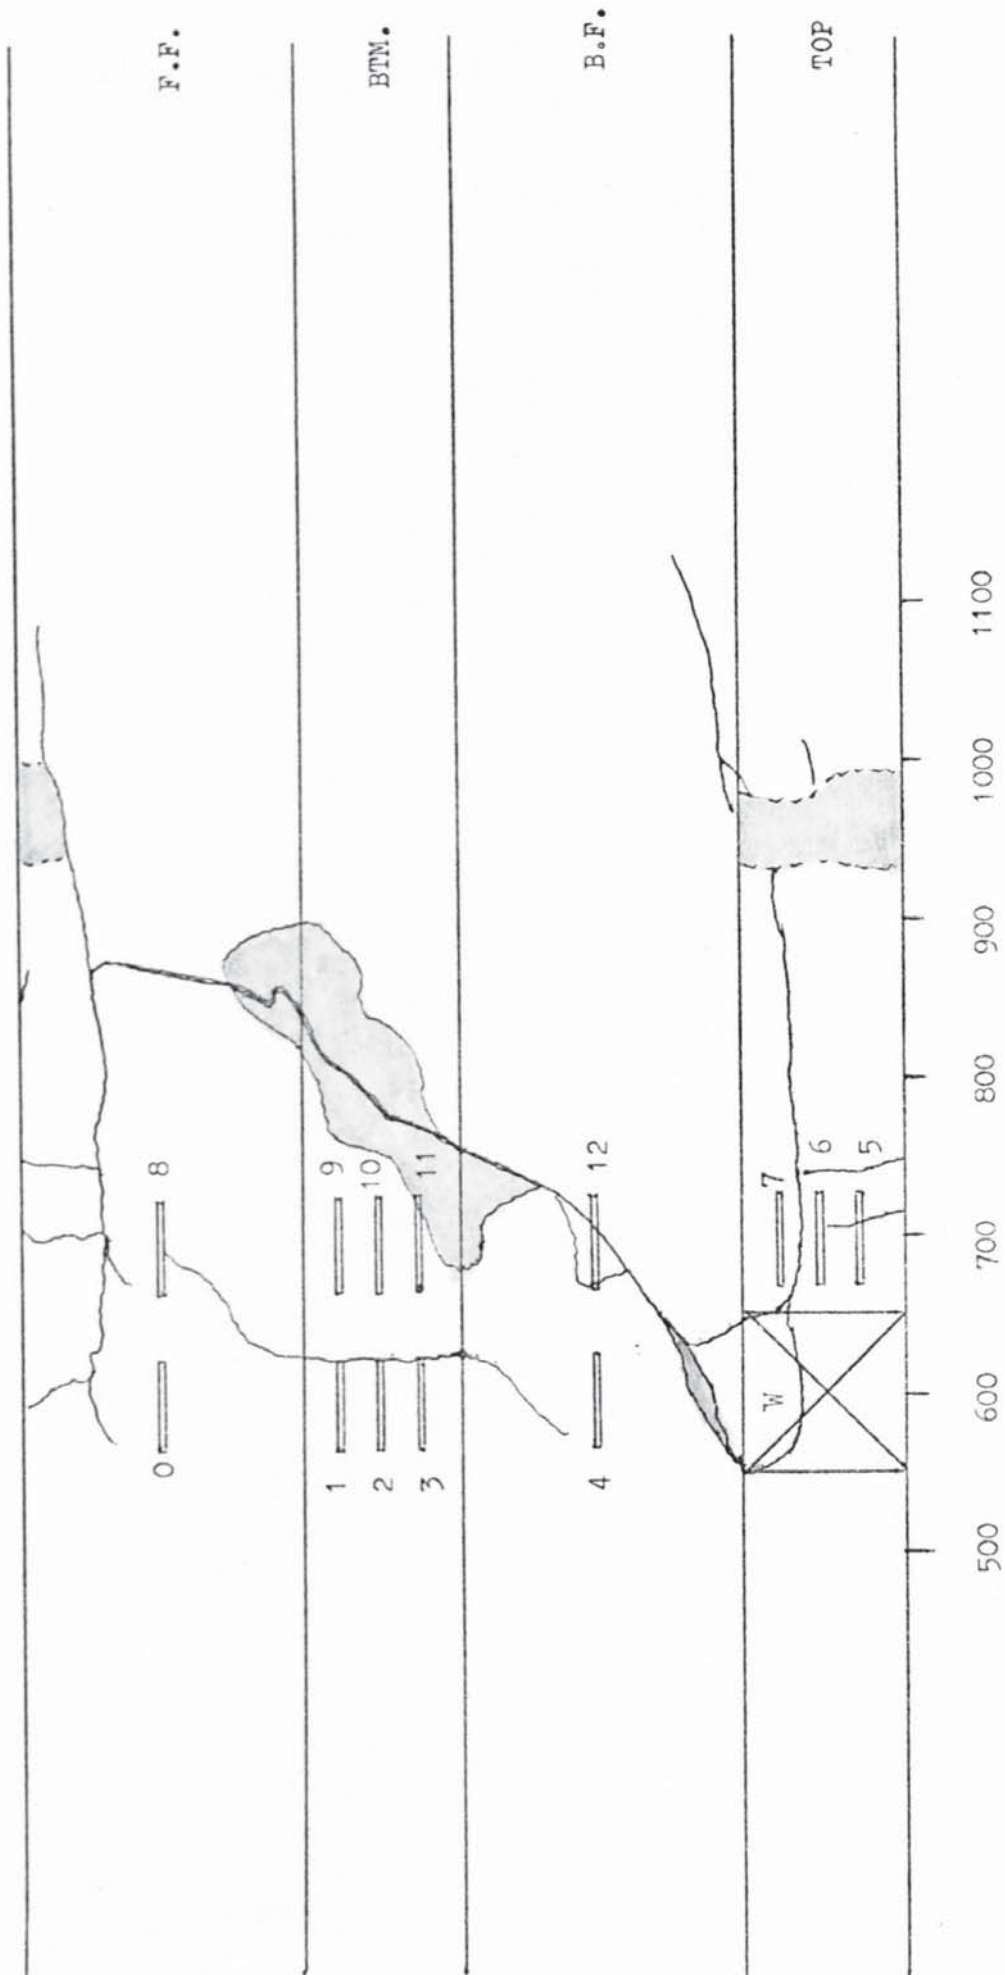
FAILURE CRACK PATTERNS - BEAM 31 ( MODE 1 )
